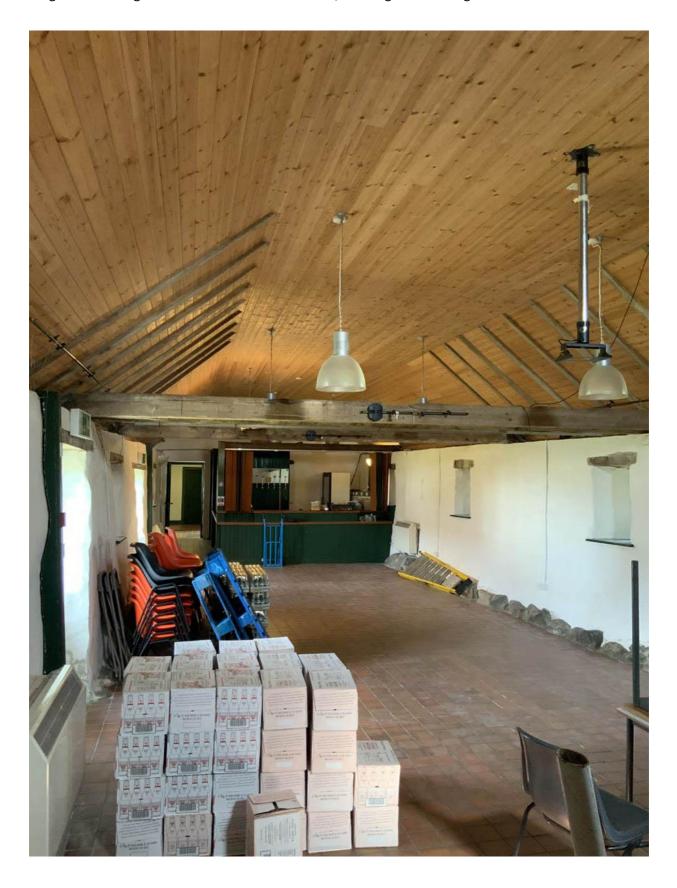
Existing painted internal opening formed in concrete (REF ID 13)
